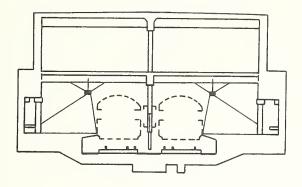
Cross Section of a Side Platform-Below Grade Transit Station (Type 1)
